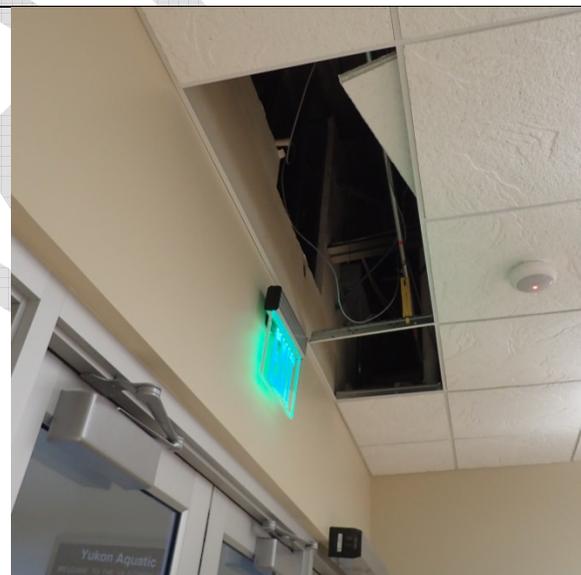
Wall framing and drywall continues vertically above vestibule doors..
